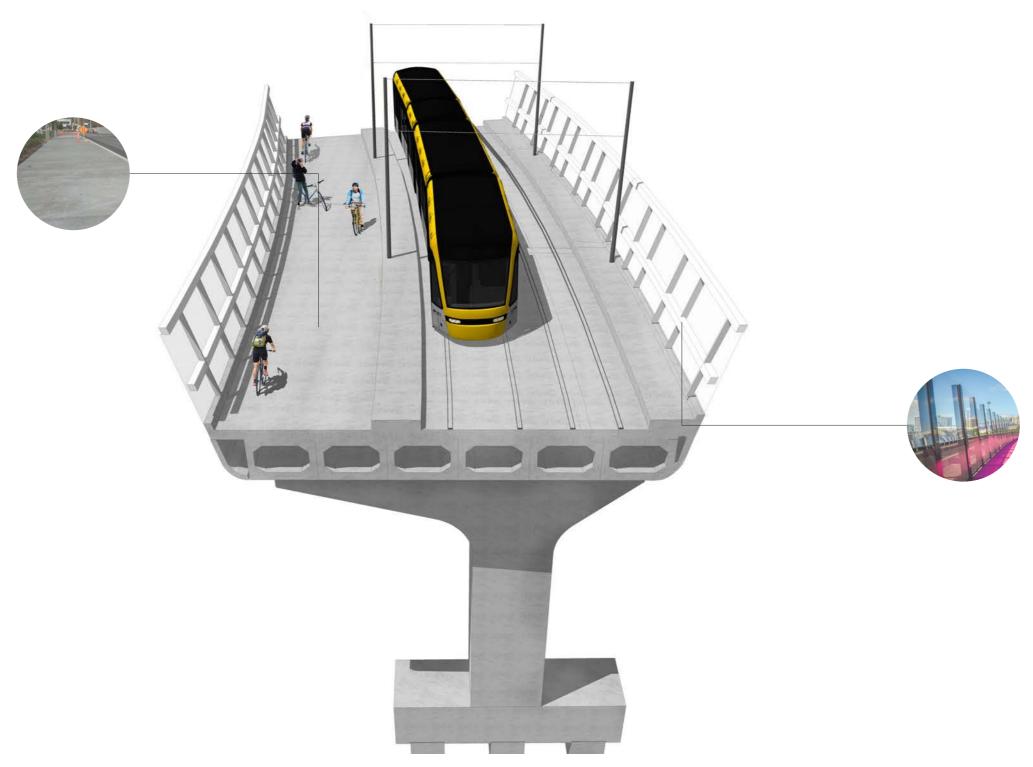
Sectional perspective of existing Upper Queen Street Bridge structure with LRV carriageway and indicative streetscape treatments
